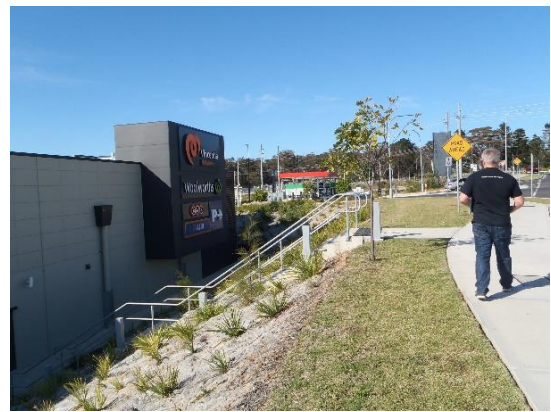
View of existing vegetation in Zone C will be supplemented – refer to landscape details in Appendix B
